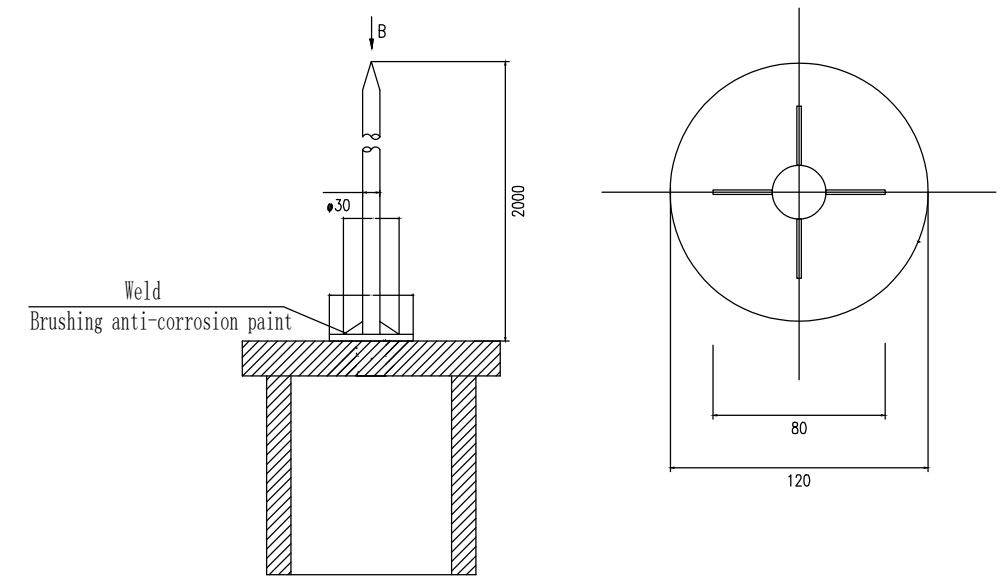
DETAILED DRAWING OF FOUNDATION BURIED PIPE GROUNDING
